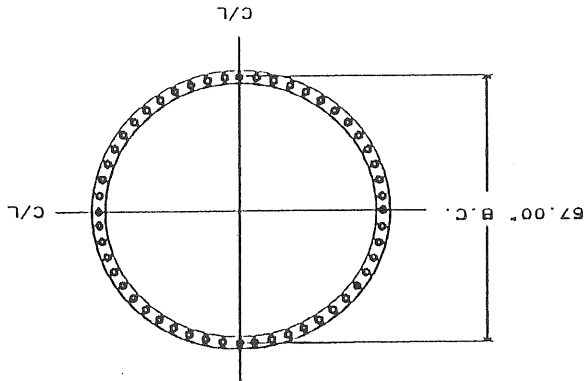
SECURELY DOUBLE-NUTTED TO ANCHOR BOLTS USED AS EMBEDMENT PLATE IN CONCRETE.
